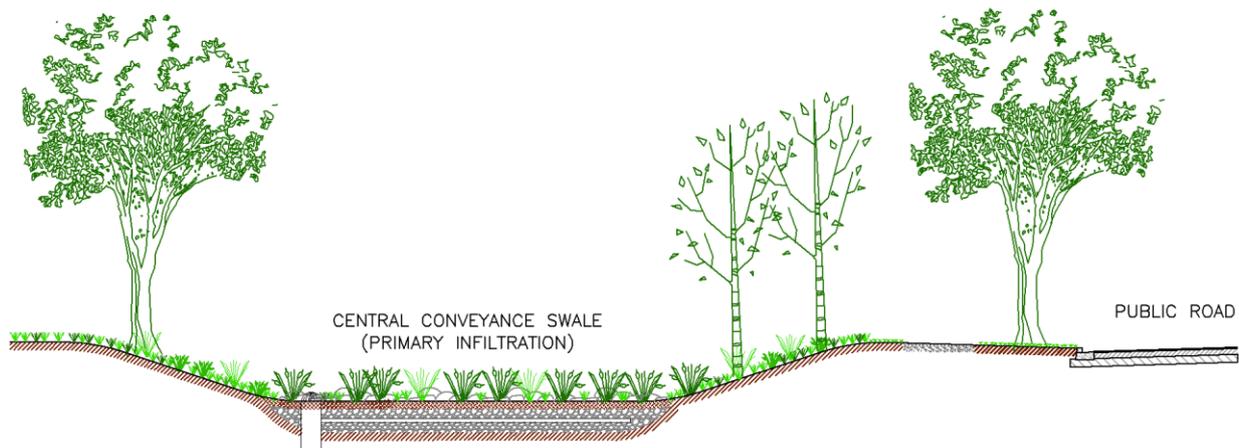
Slope Hill central conveyance swale infiltration section.
